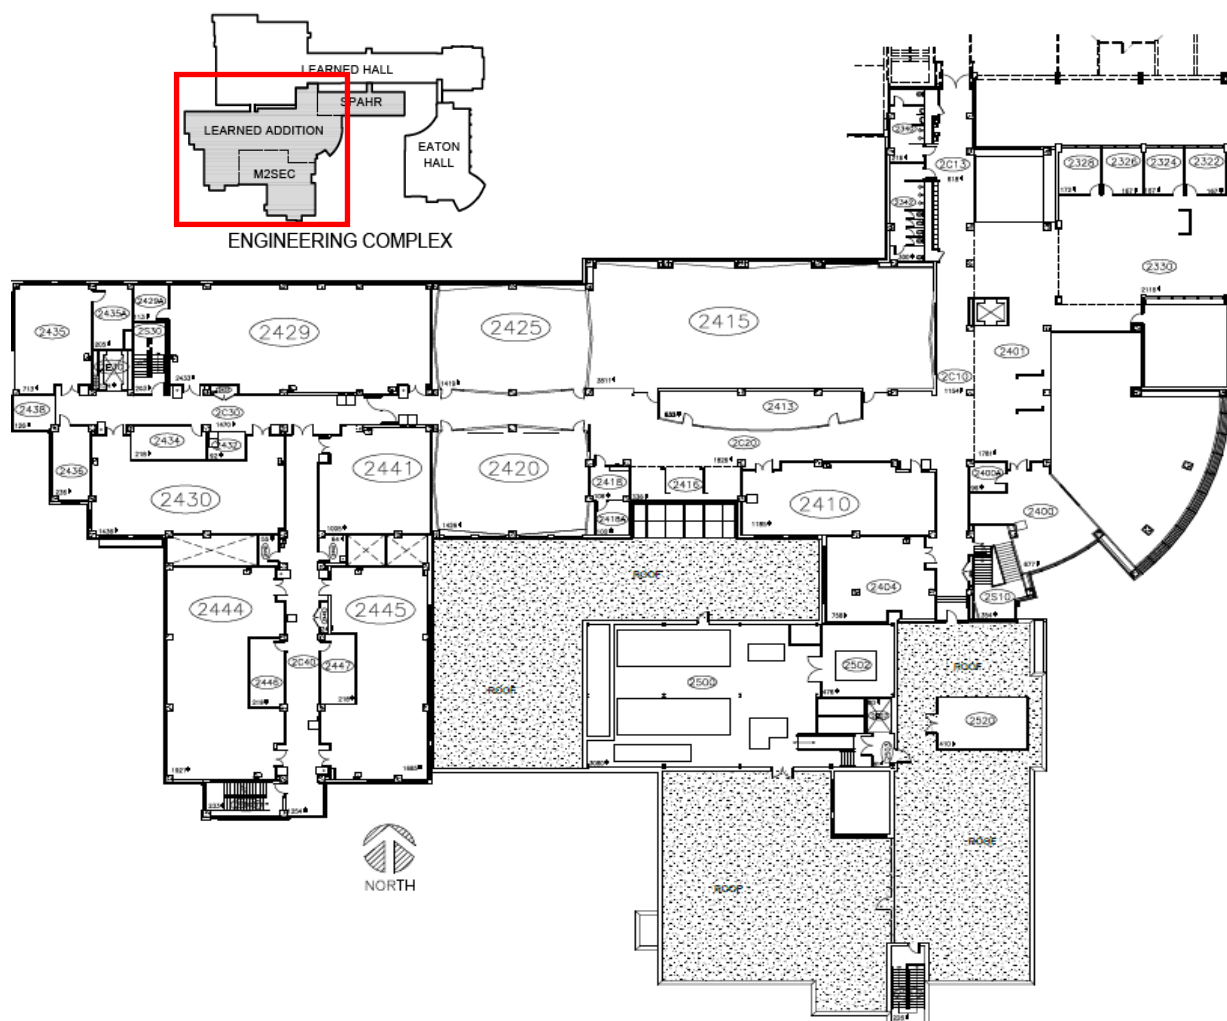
Illustration of the Learned Engineering Expansion Project 2 (LEEP2), second floor. Inset shows the School of Engineering complex which includes Learned Hall, Spahr Engineering library, and Eaton Hall with the newest facilities outlined in red (Learned Addition or LEEP2 and M2SEC).
